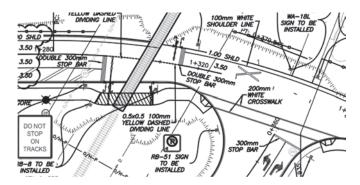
Womacks Rd & Gregg St Design Pavement Markings
